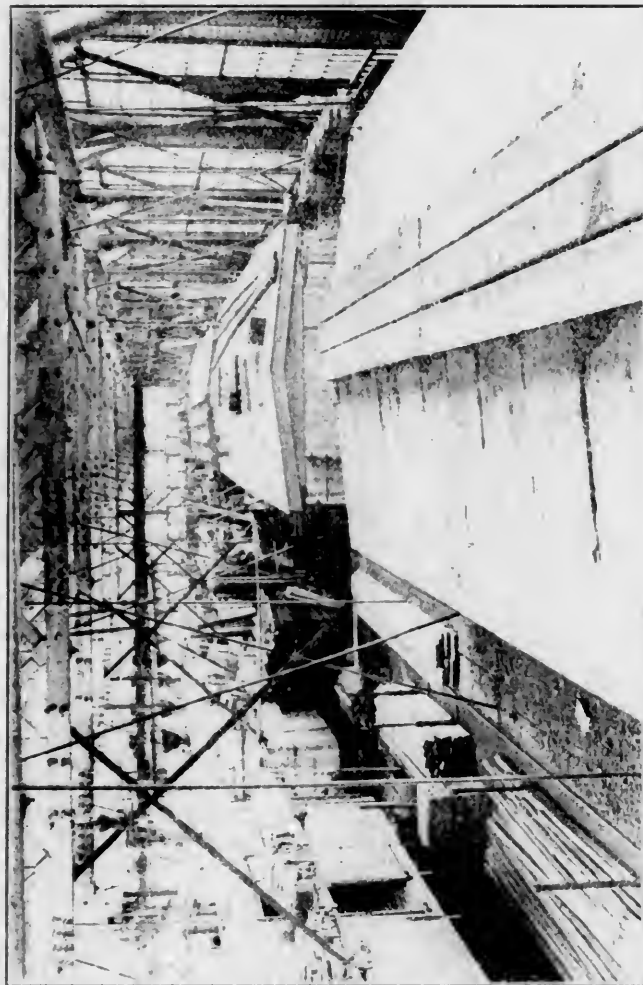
A VIEW LOOKING THROUGH THE FIFTH STAGE OF CONSTRUCTION.
